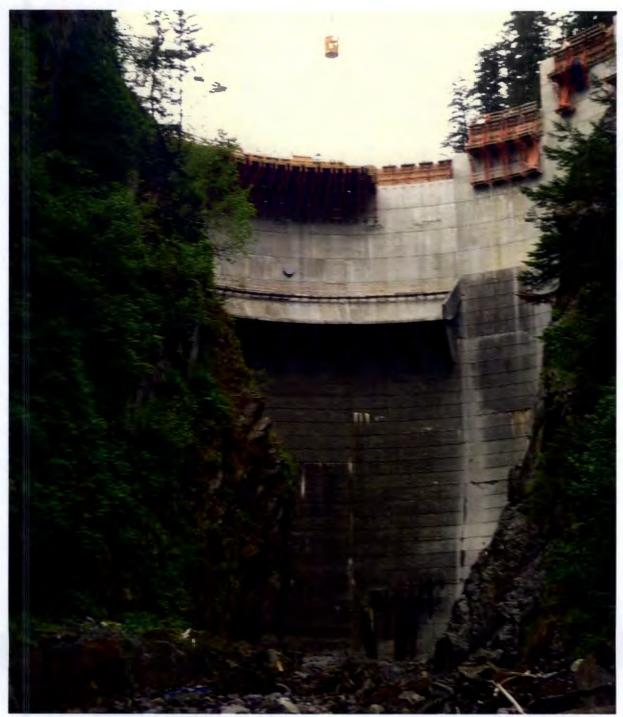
Drainage Tunnel and Scour Wall, Crux Subsurface (Crux) began working night shift on the dam curtain grouting and completed 3 holes on the right abutment. There will be a total of at least 9 holes on the right abutment and 17 holes on the left abutment. No geological surprises have been discovered, however, the contractor has had difficulty with the drilling.
